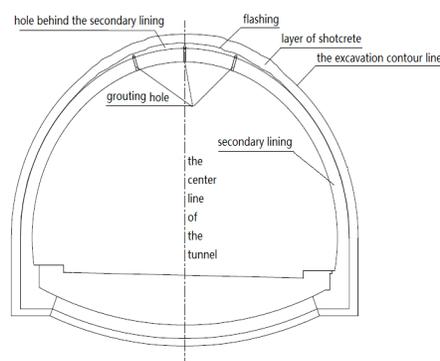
Grouting and air flow section Fig 8. Grouting and air flow plan sketch
